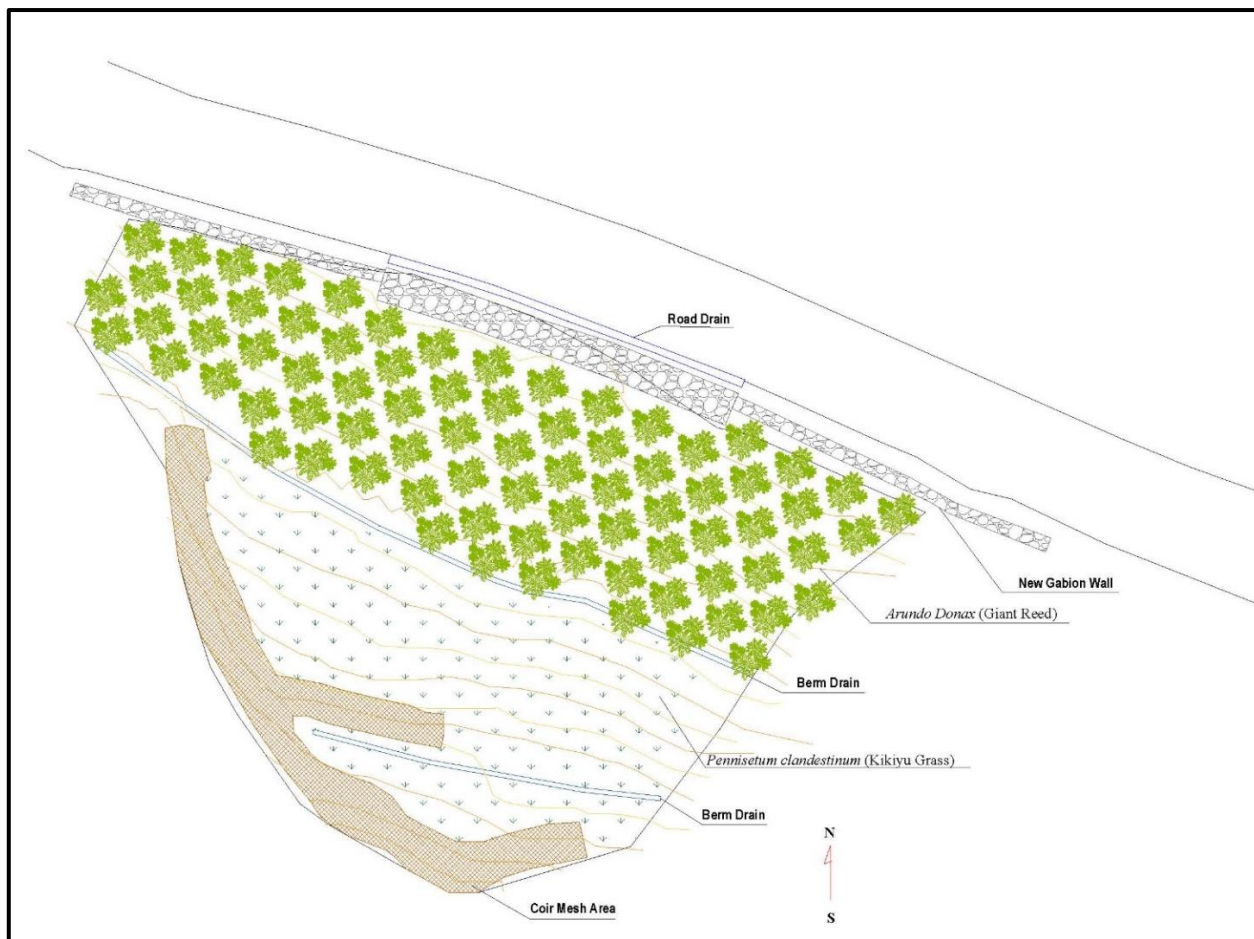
Plan view of section between culvert 75-6 and 75-7
